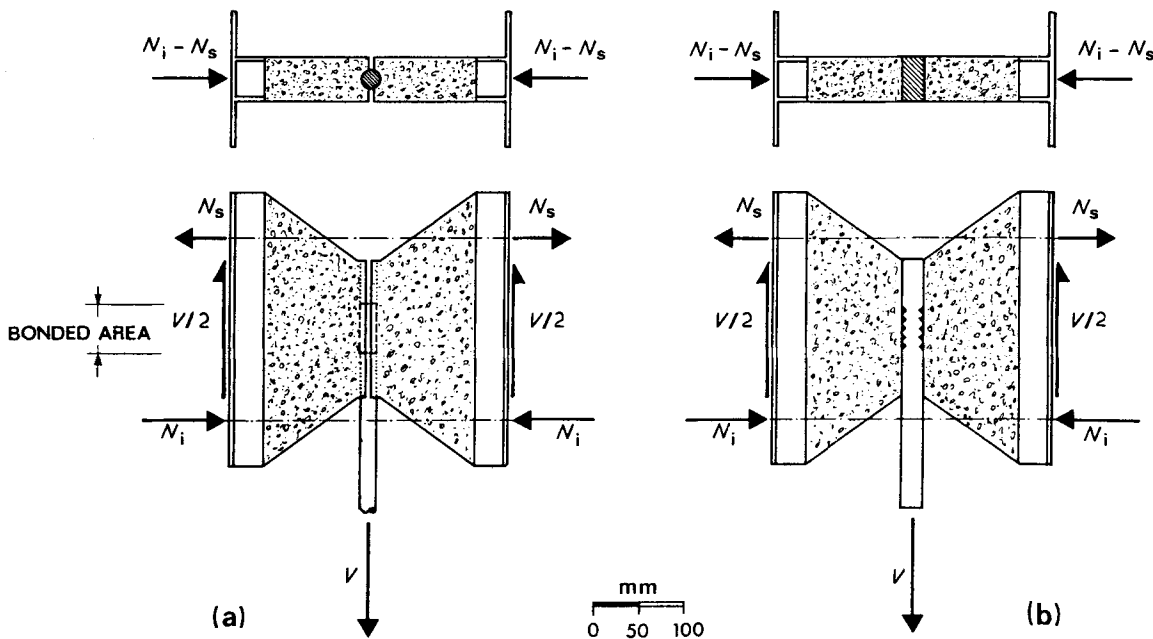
Different specimens adopted in the analysis of bond behaviour after concrete splitting: (a) Type 1 [14, 16] with a round deformed bar; (b) Type 2 [15] with a special bar having a rectangular cross-section.
